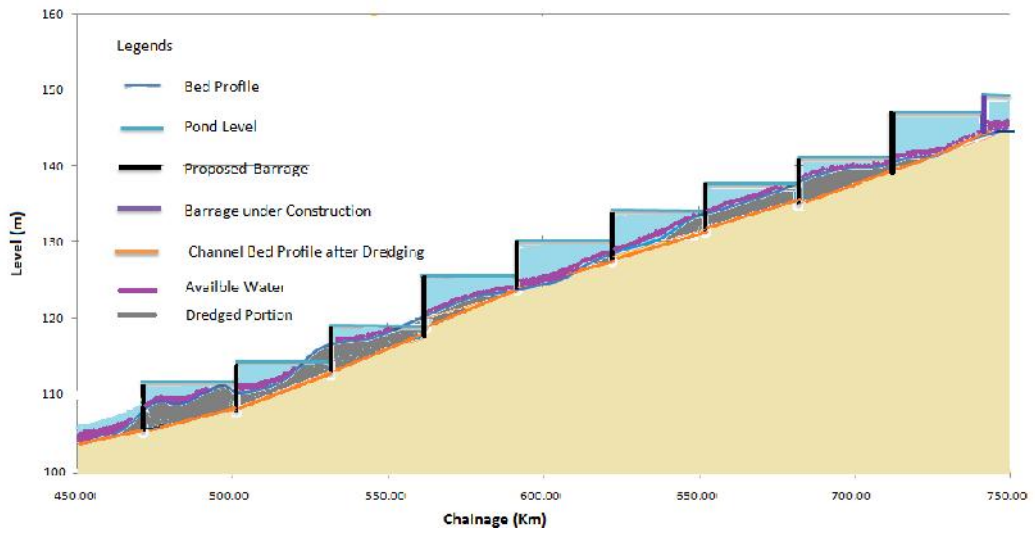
Barrage Location for Stretch-3 (Ch. 453 km to Ch. 743 km)
